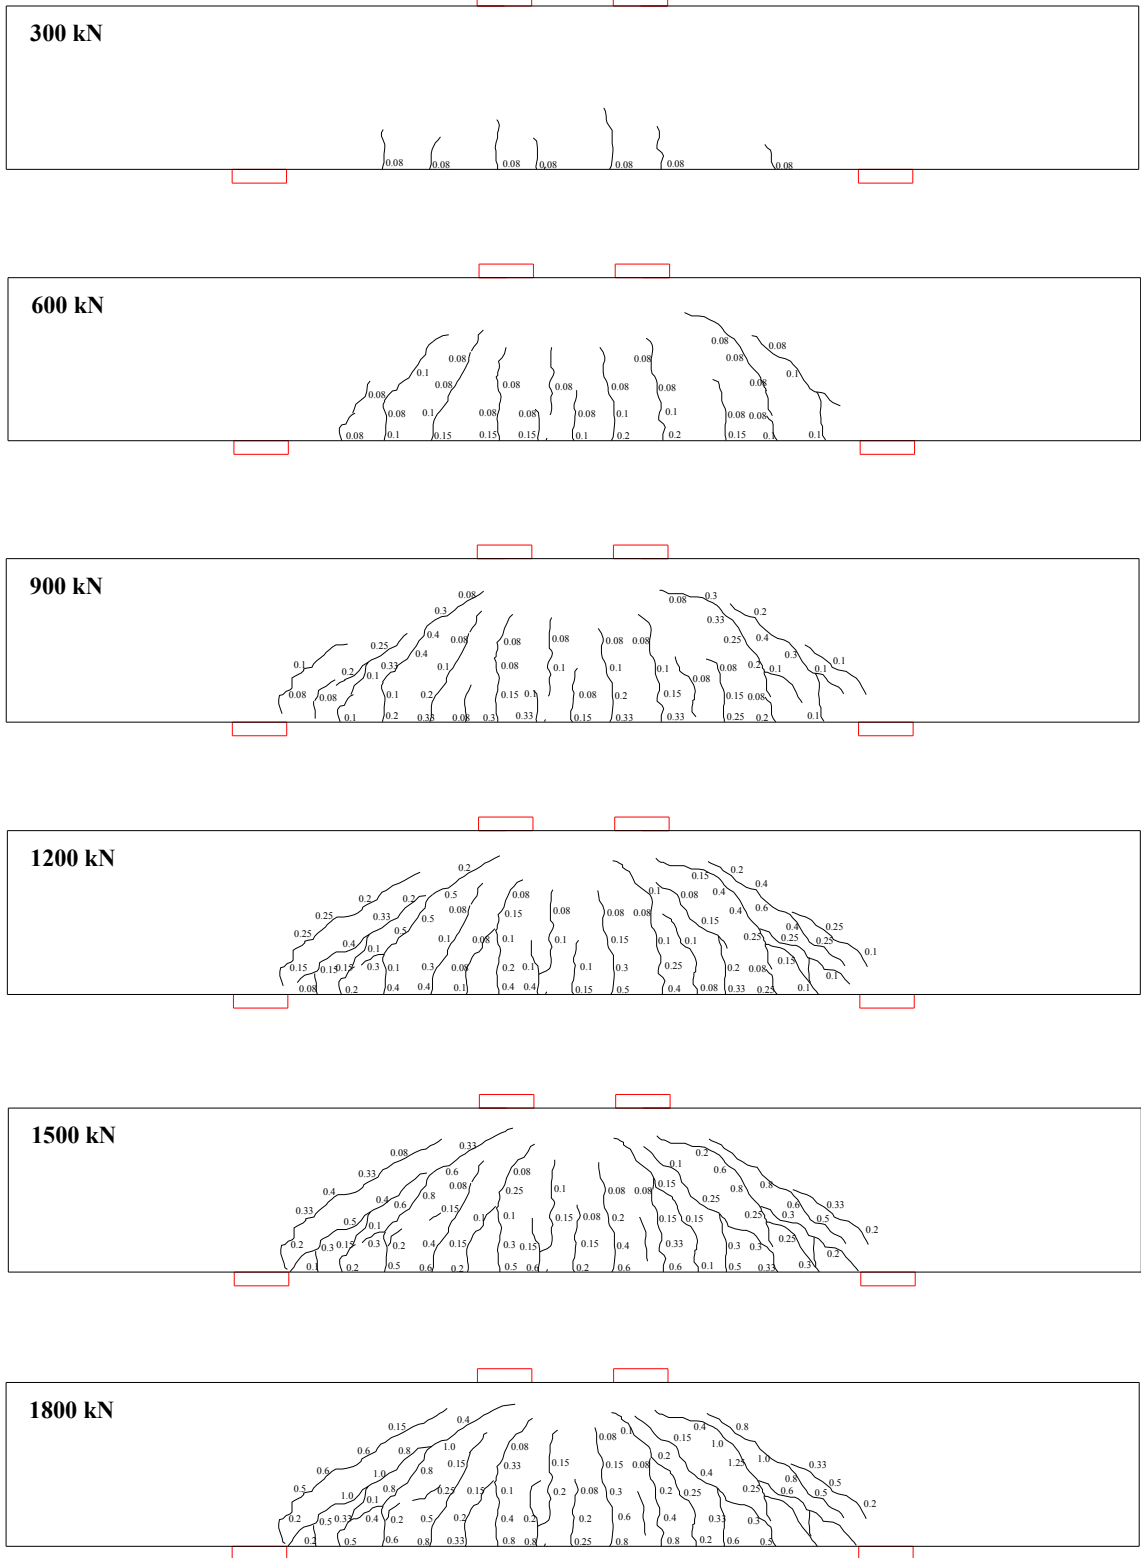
Crack patterns at different loading stages of specimen MS2-3
